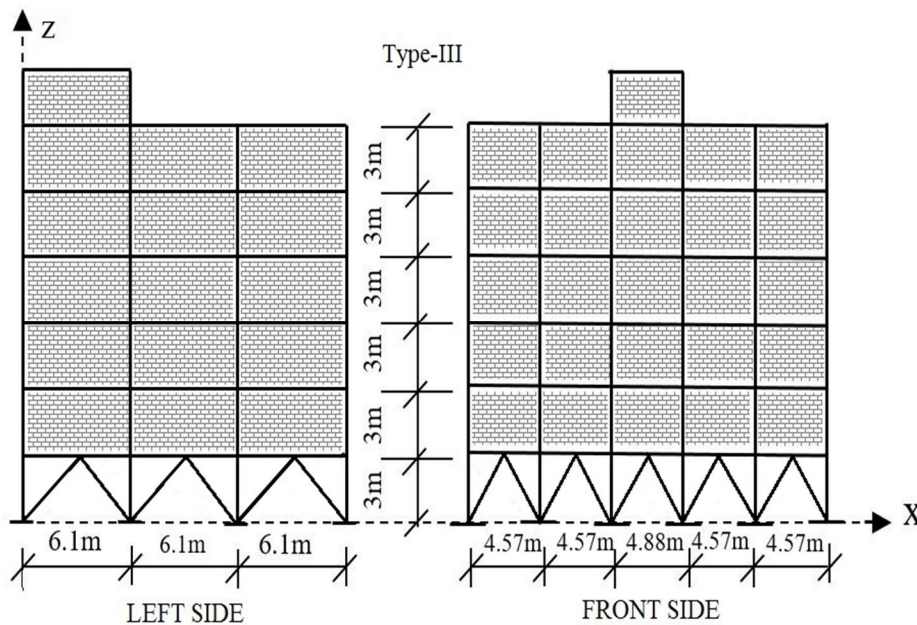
Elevation of first soft story in six storied building with bracing Type-III (K)
